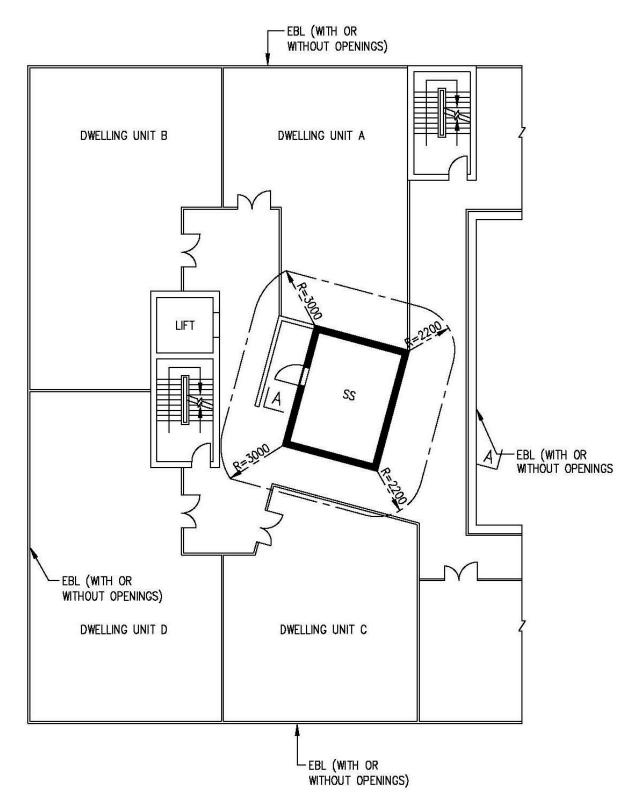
(a) REQUIREMENT ON SETBACK DISTANCE OF SS WALLS (WITHOUT DOWN-HANG BEAM)
